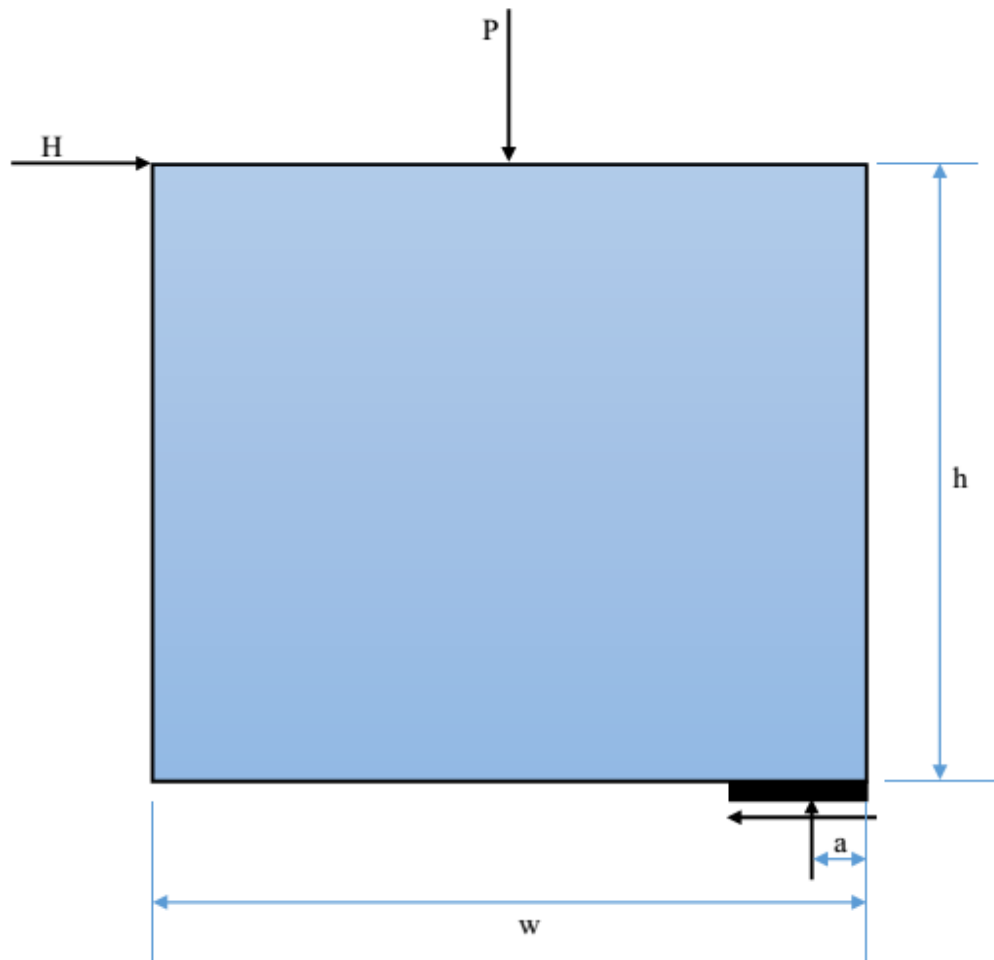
Simple Mechanistic Model of Wall Behavior for Undamaged Wall
